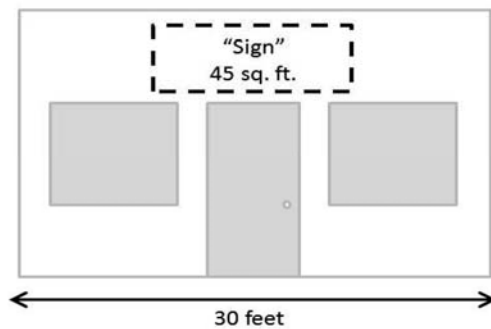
CALCULATING SIGN ENTITLEMENT - MULTI-TENANT BUILDING
